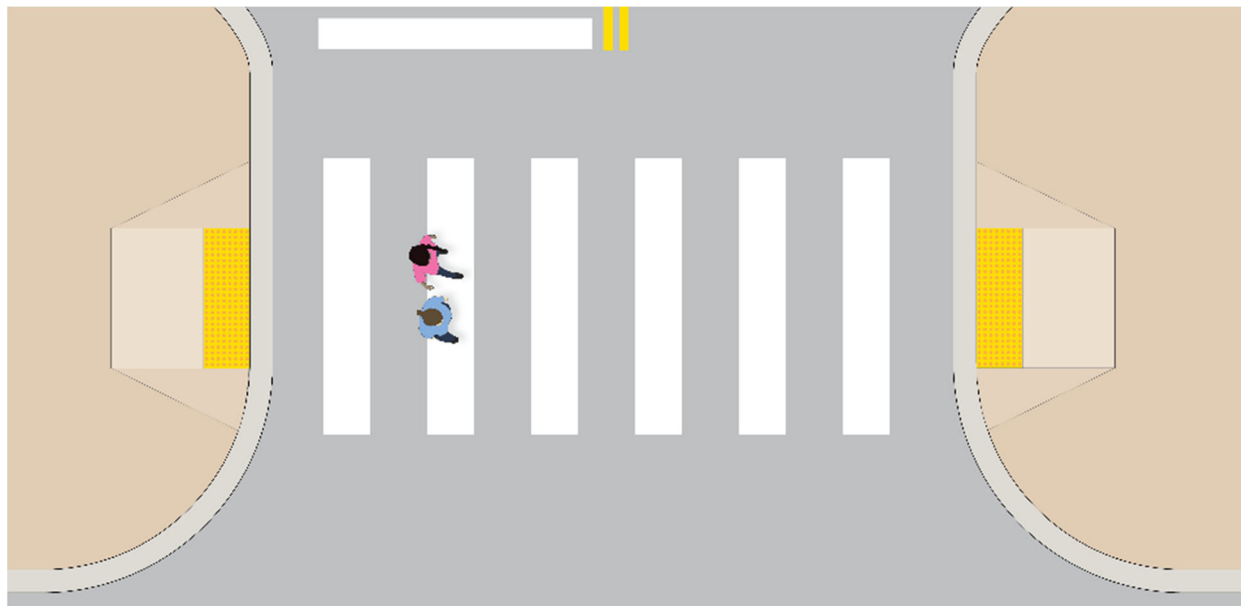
CROSSWALK MARKINGS PLAN VIEW
